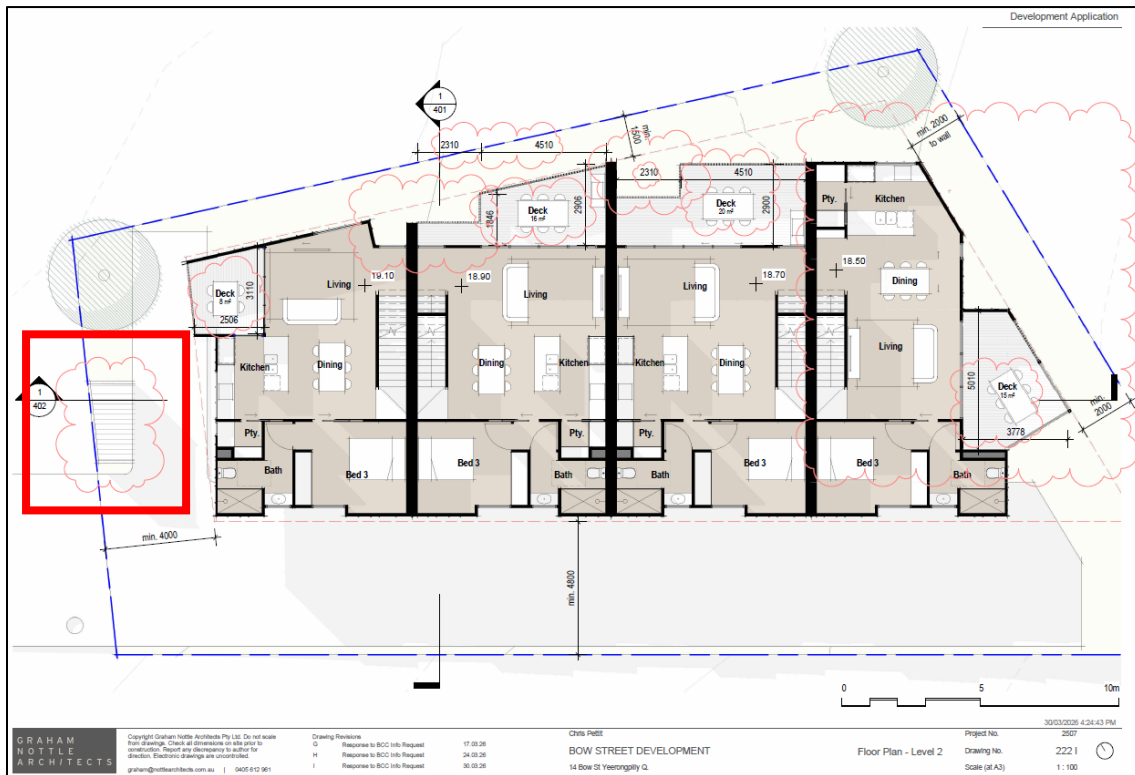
Revised Floor Plan - Level 2 (Graham Nottle Architects, 2026)
